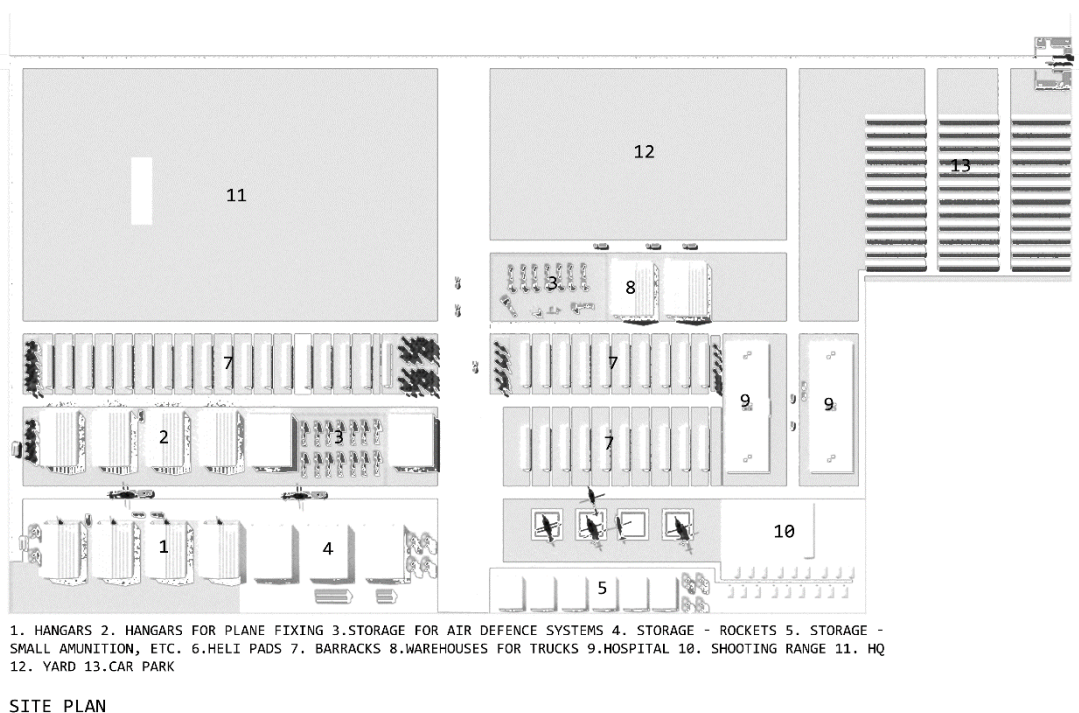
Site plan of the proposed alternative 2. (Džiaugys, 2023)
